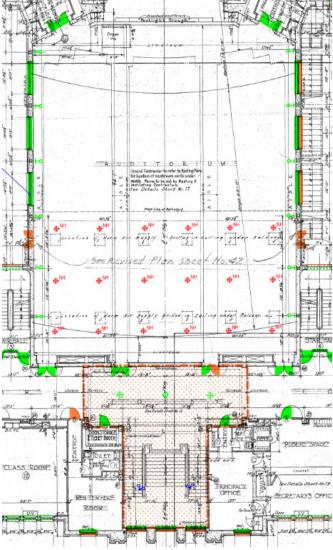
First Floor Plan of Auditorium, and main entry
